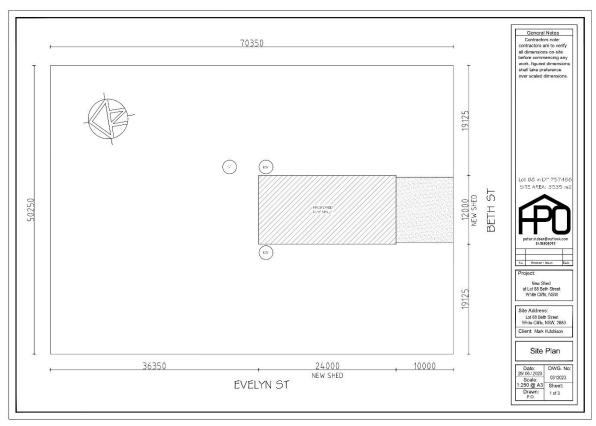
Proposed site plan new shed M Hutchison Lot 88 in DP 757488 Beth St White Cliffs
